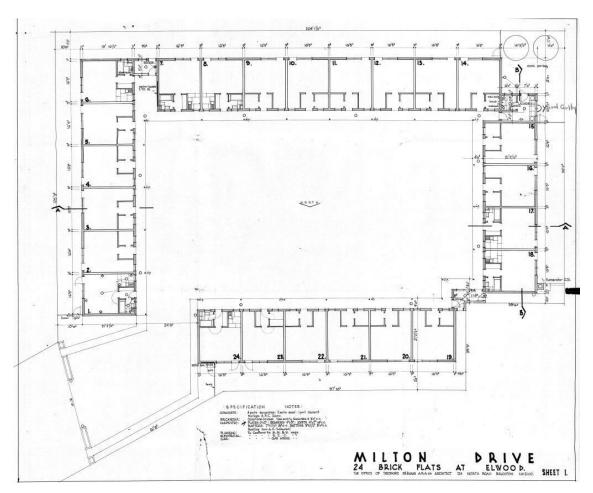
Original layout plan (Source: City of Port Phillip Building Archives)
